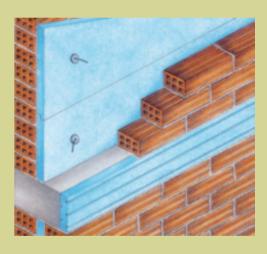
Internal cavity wall insulation is feasible when building a new house.
